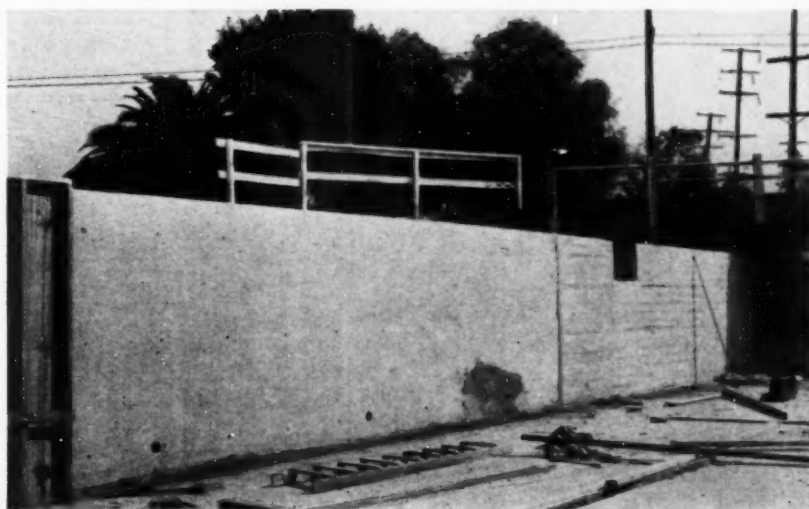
SECTION OF REINFORCED CONCRETE STORM DRAIN
